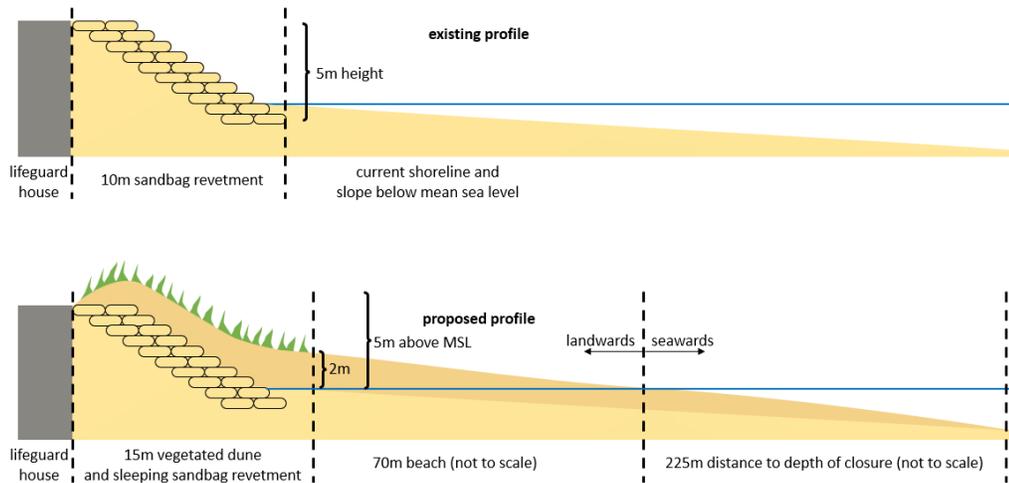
Existing and proposed Alkantstrand profile on cross-section Z-Z with the new sediment shown darker
